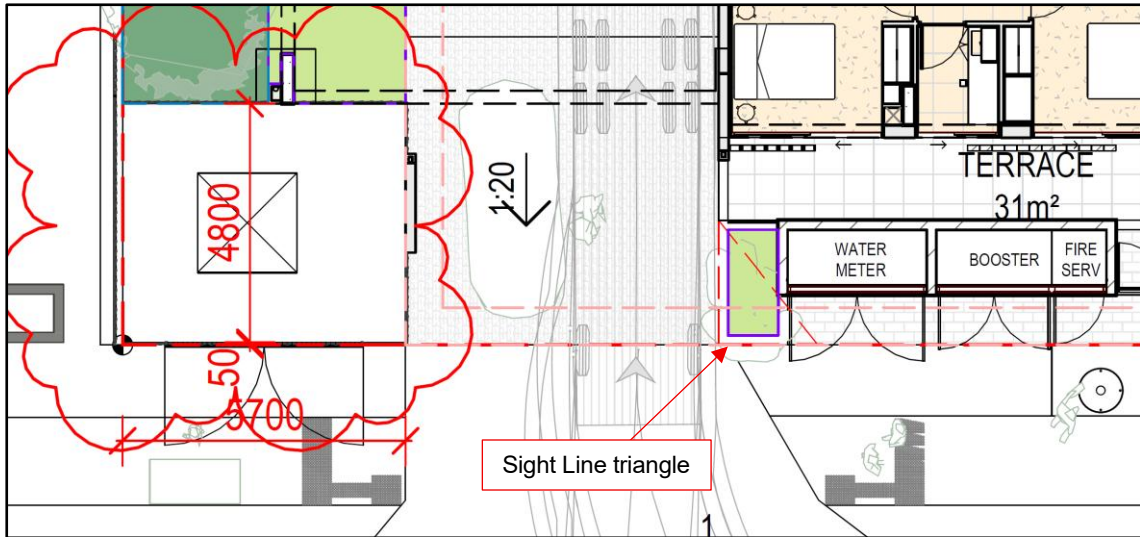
Proposed Driveway Sight Line (Source: MODE)
